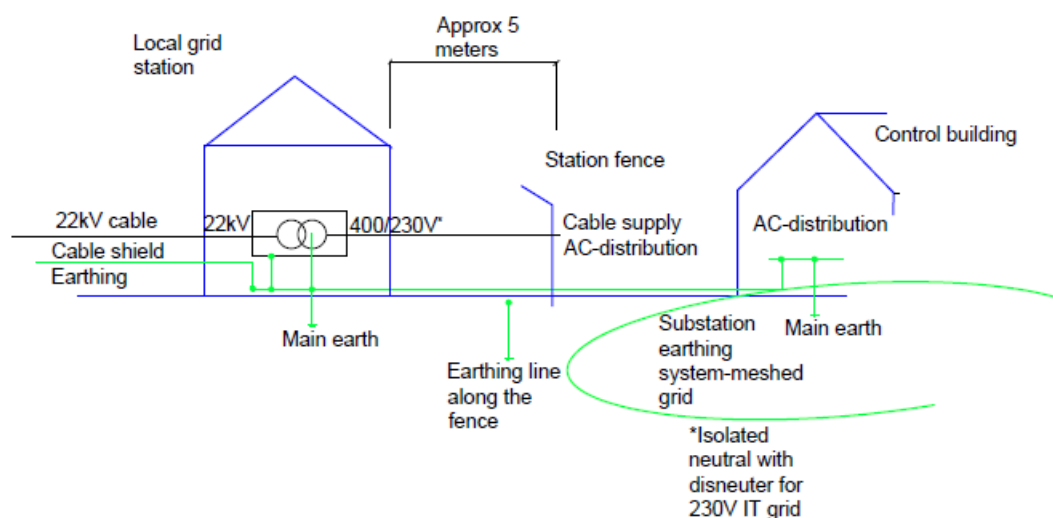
Example of 22 kV cable shielding connected to the substation's earthing and resulting earthing
